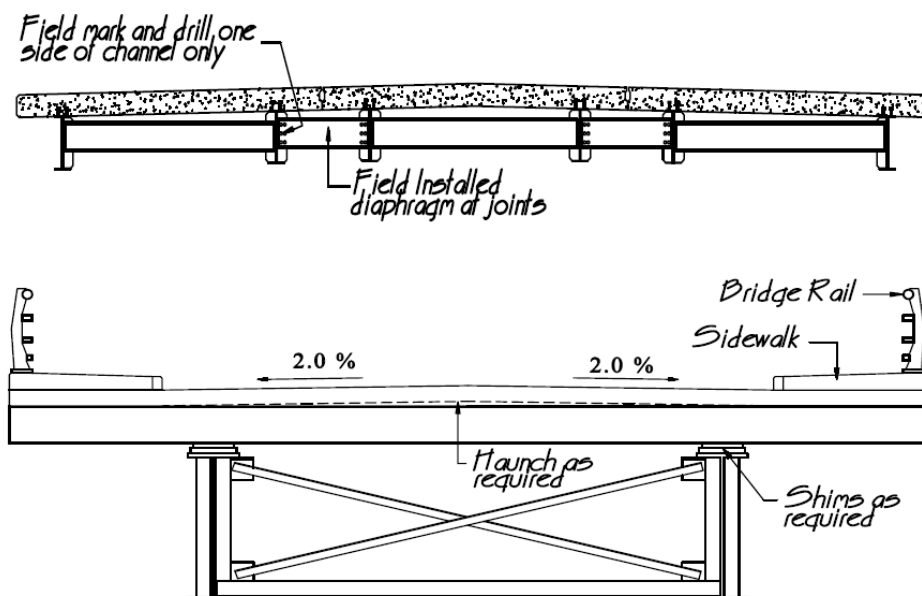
Inverset bridge system detail (NYDOT, 2010).
